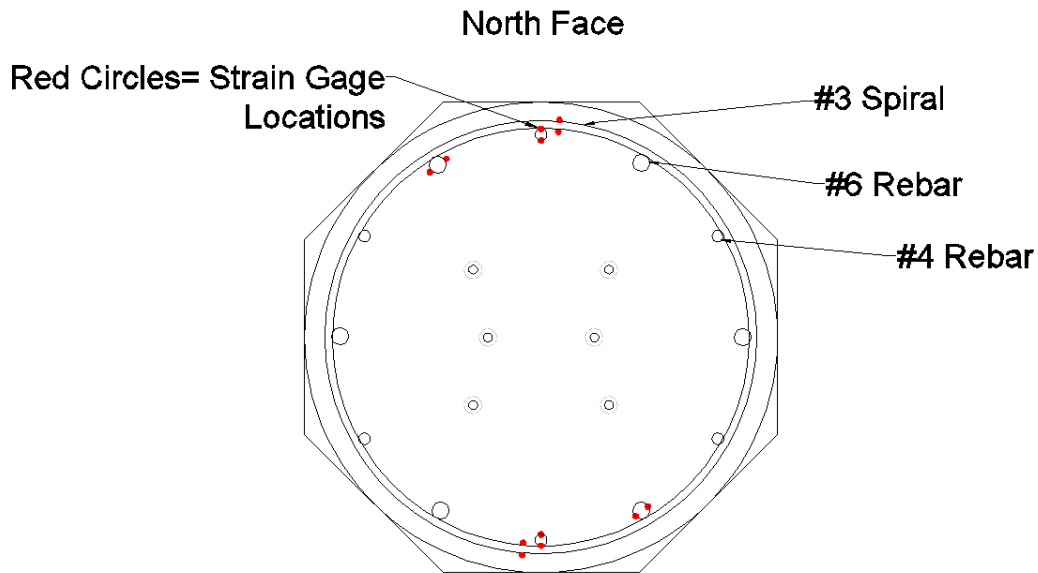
Column elevation view of 3-wire strain gauge placements.
